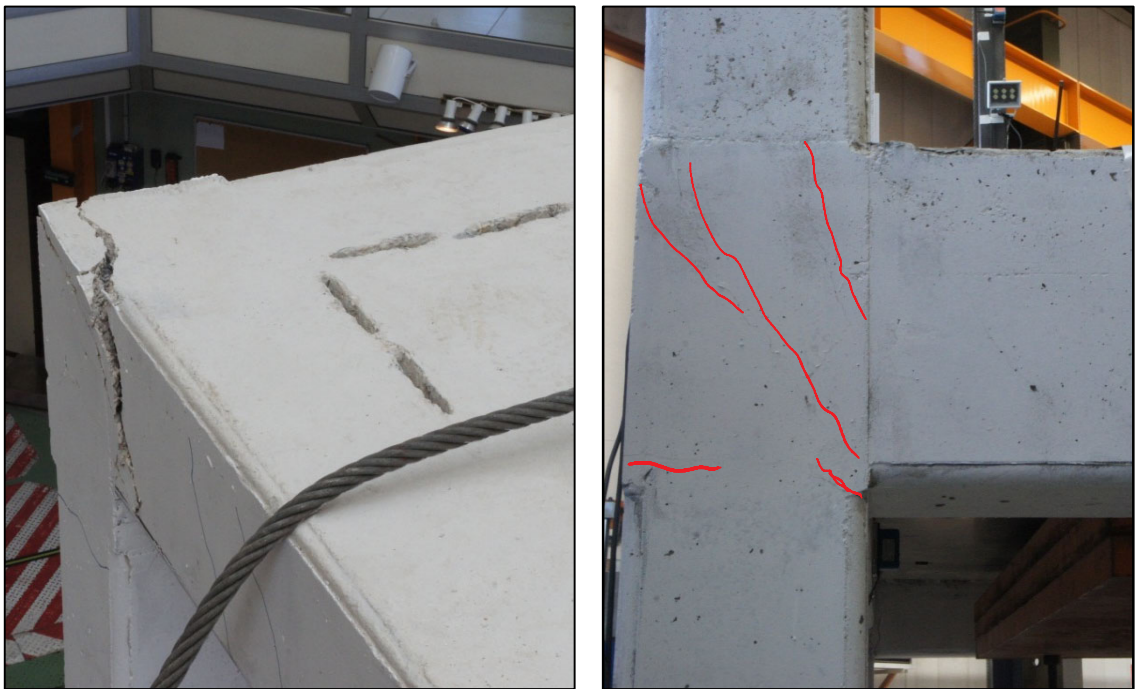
Damage of joints J2A-1<sup>st</sup> (left) and J2B-1<sup>st</sup> (right) at 0.15g – bare structure
